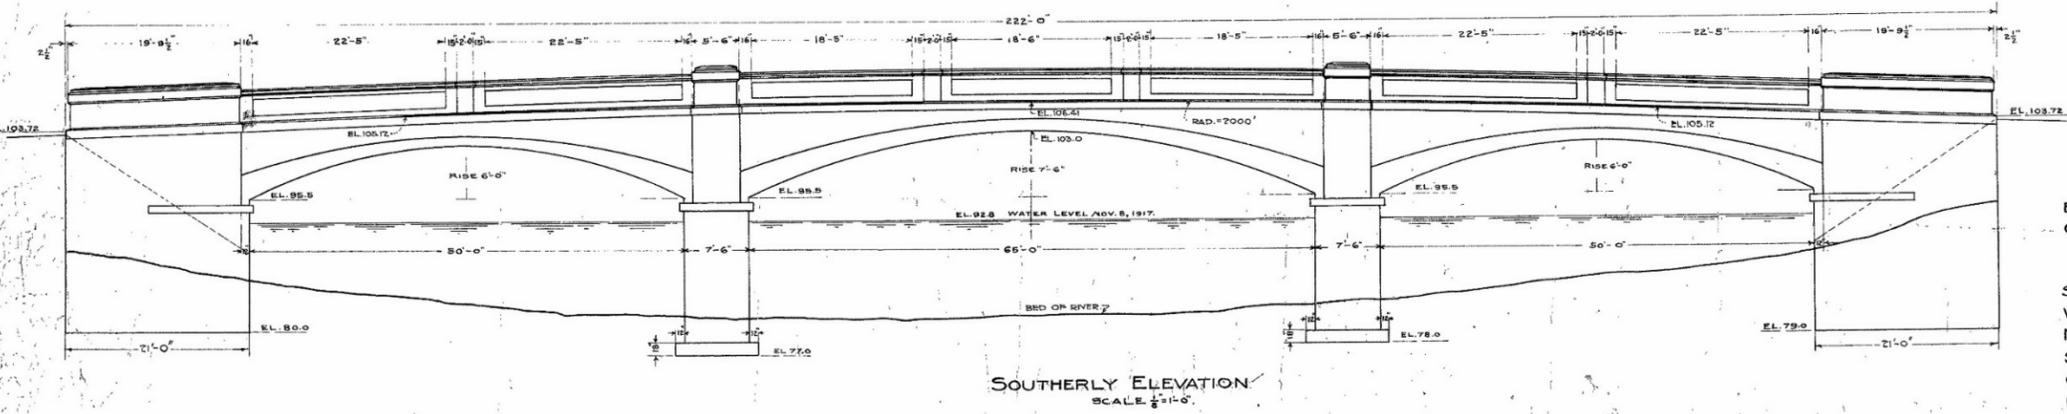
Boston Road/Route 3A Bridge Plan and Profile Drawing
